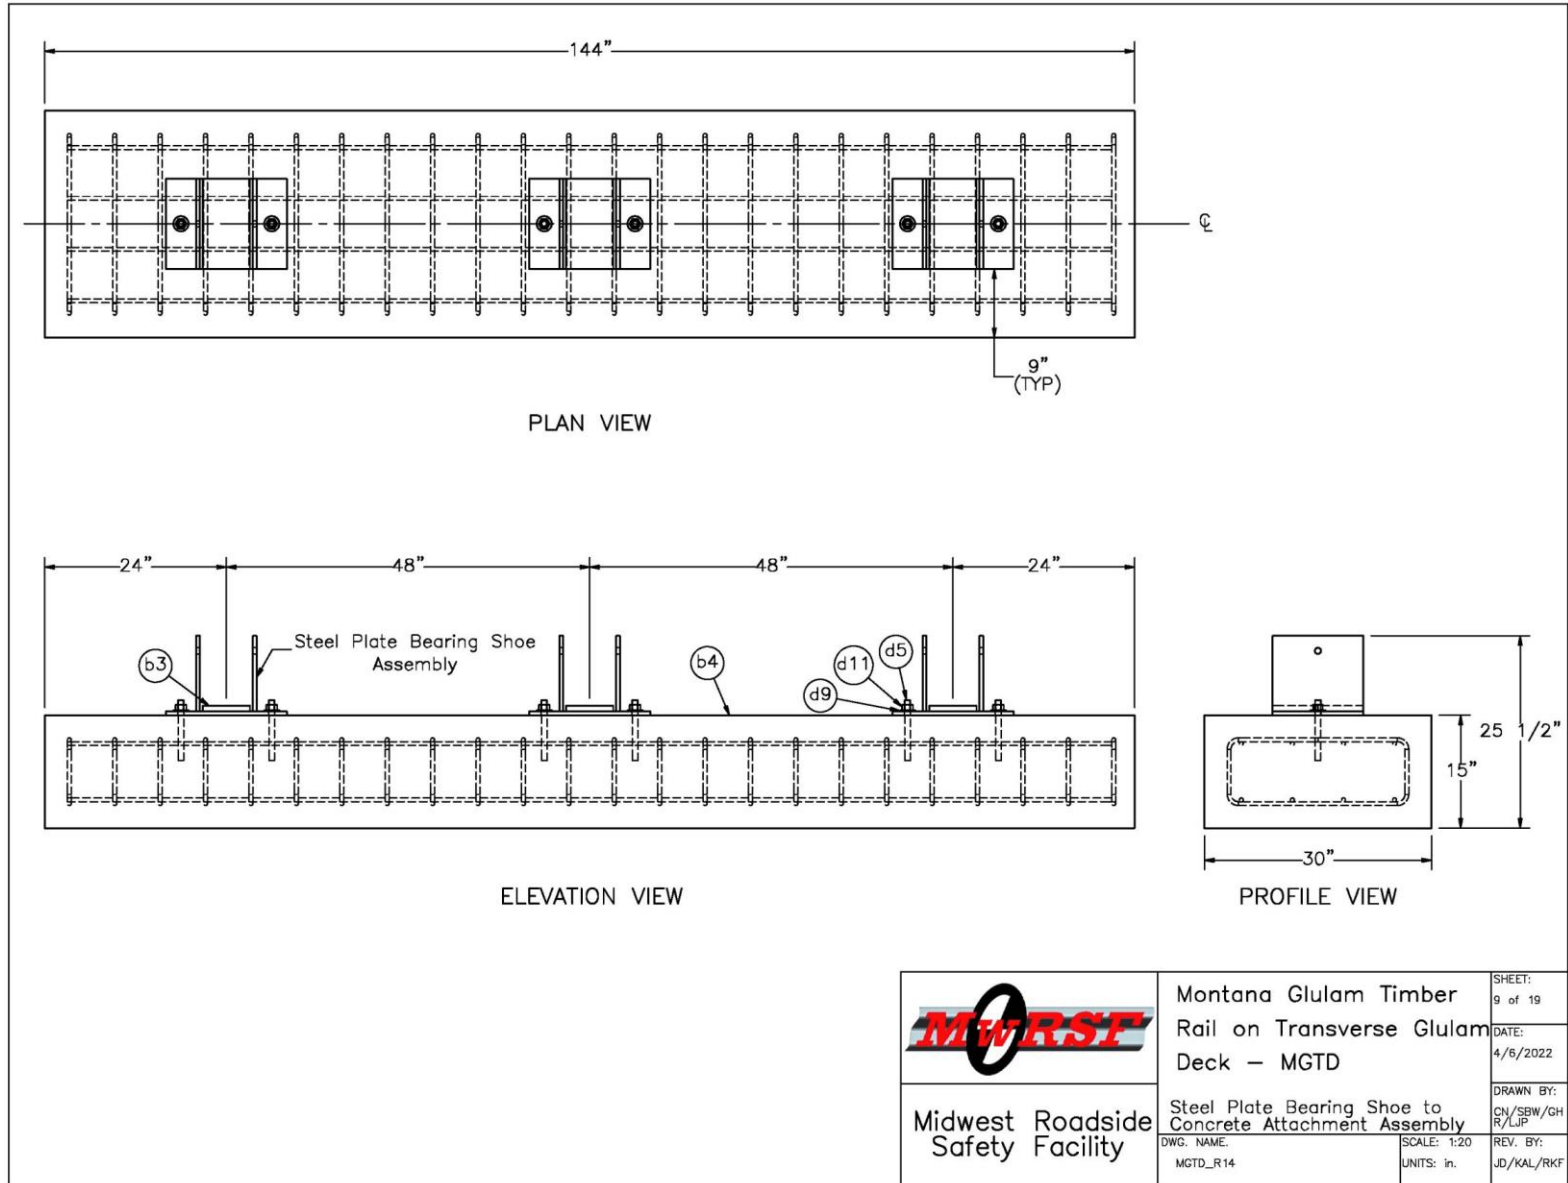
Steel Plate Bearing Shoe to Concrete Attachment Assembly, Test Nos. MGTD-1S and MGTD-1D
